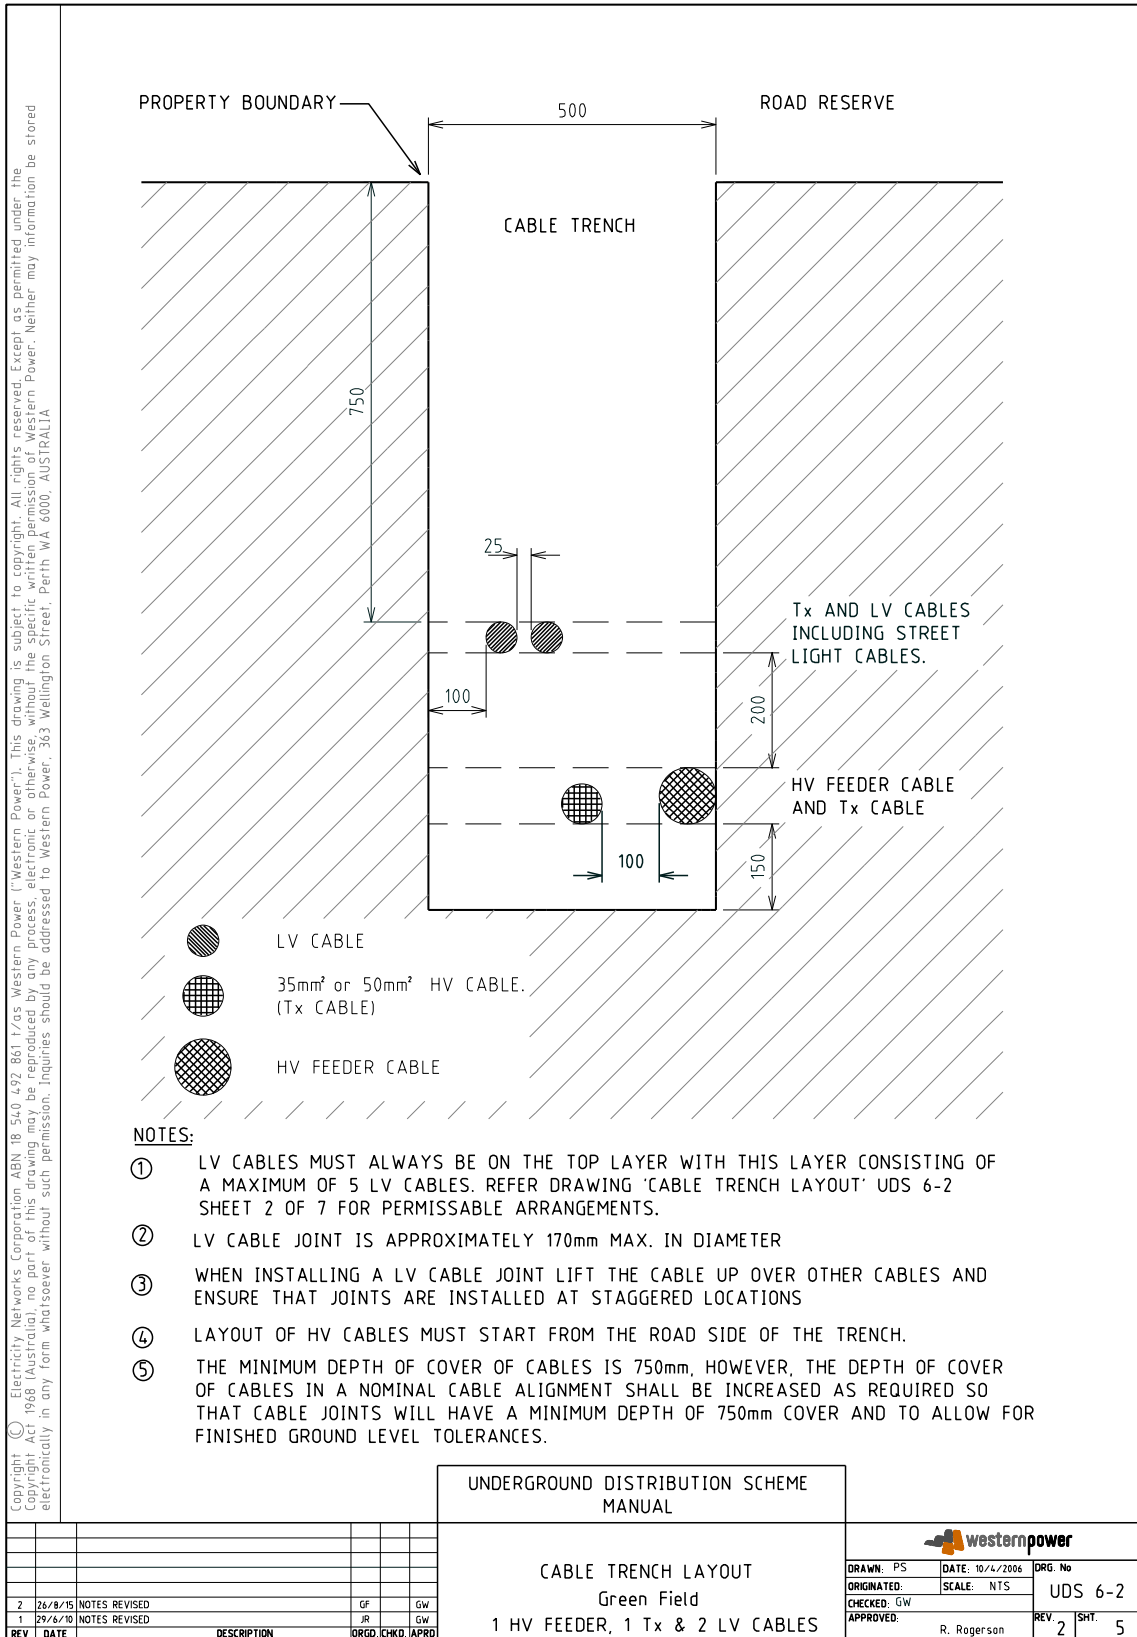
Cable Trench Layout (Sheet 5 of 7)
